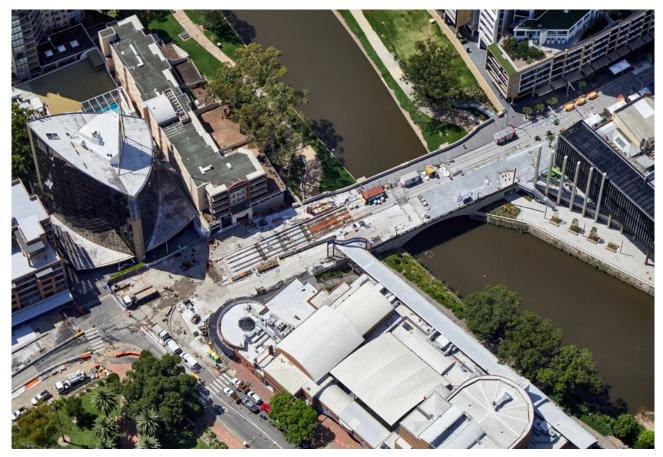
Aerial image of construction occurring in Church Street at Lennox Bridge in Parramatta (TfNSW, January 2022)
